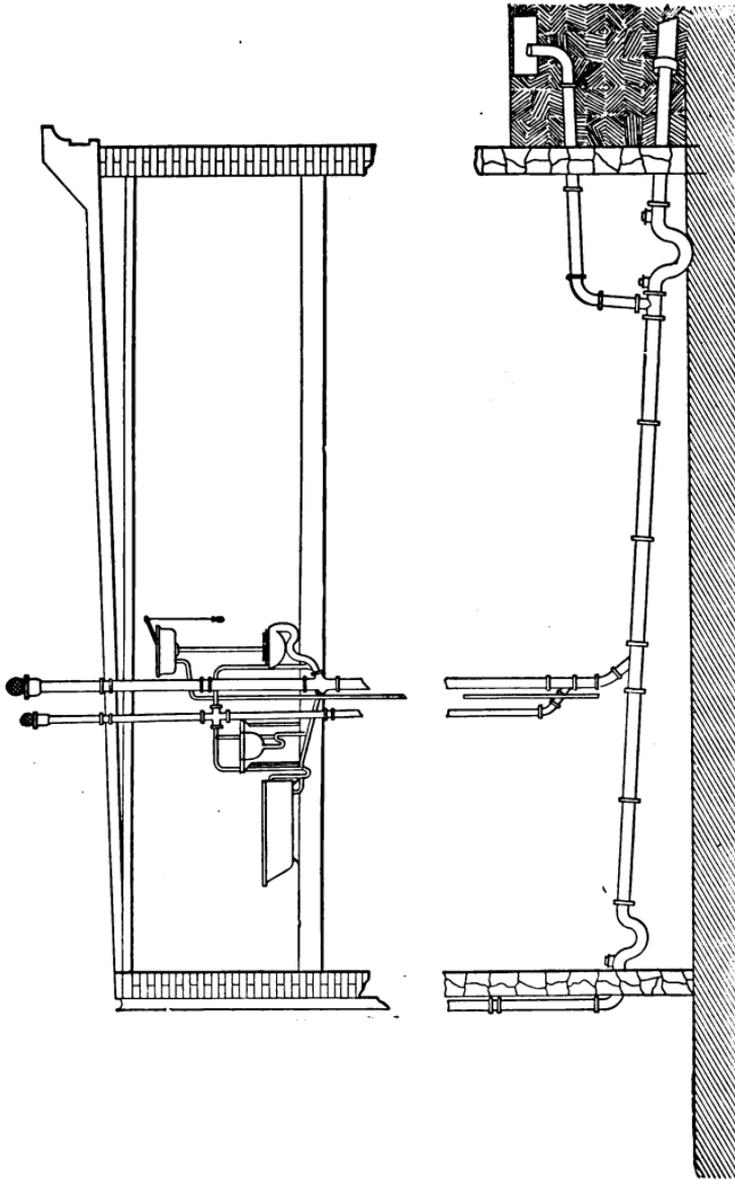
SYSTEM OF HOUSE DRAINAGE, SHOWING THE PLUMBING OF A HOUSE. (H. BRAMLEY.)
